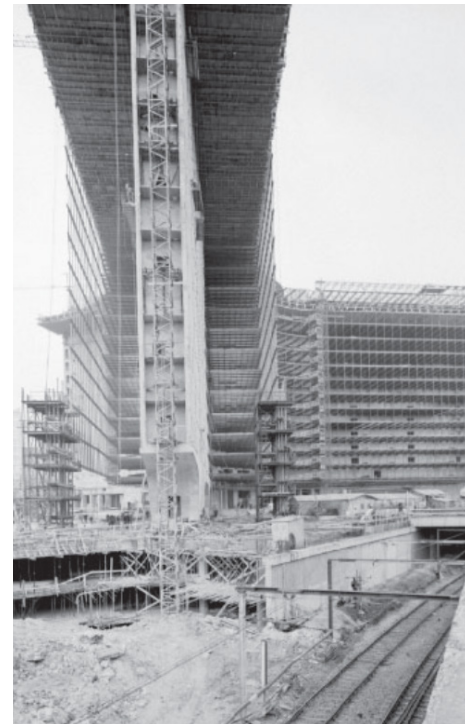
(right) Construction site of the *Berlaymont* building 1968. The innovative and technologically advanced load-bearing structure with its preflexed steel beams and its central concrete core together with the nearby running subway line become visible (Sterken, 2015).
